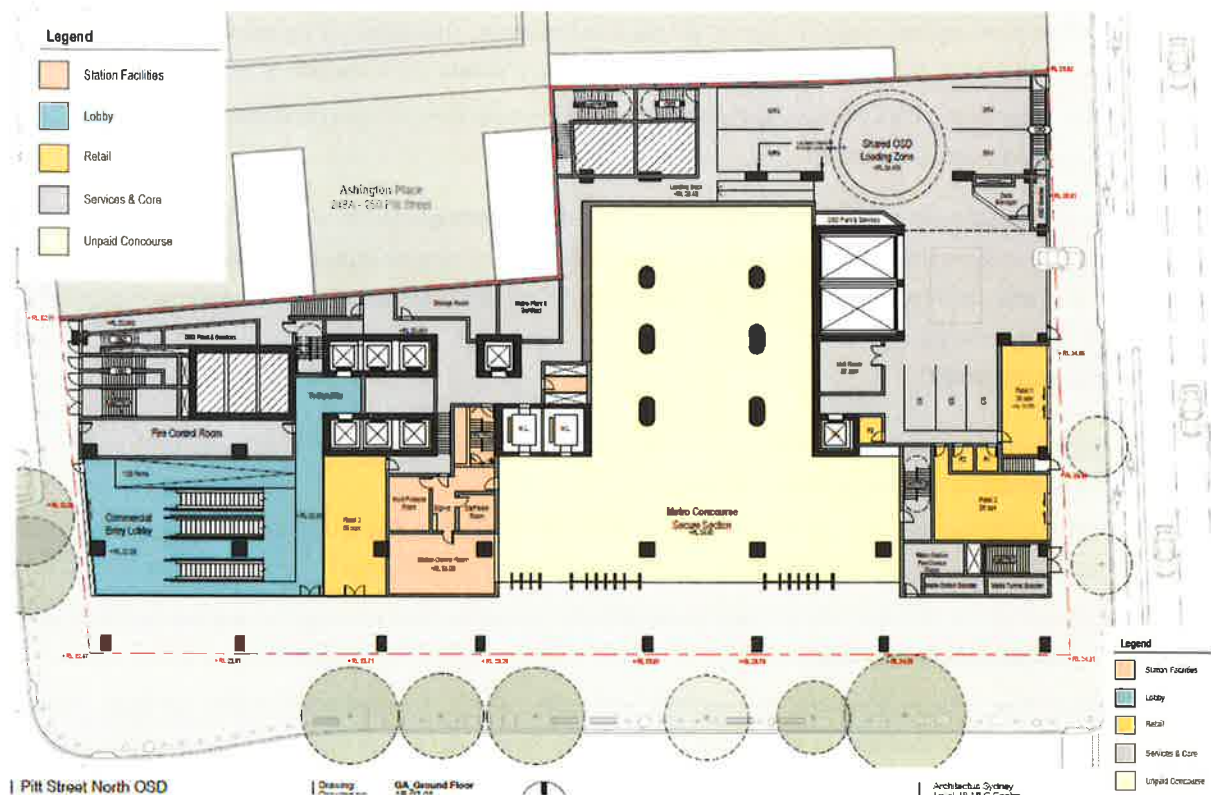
| Commercial scheme indicative ground floor plan (source:RtS)
